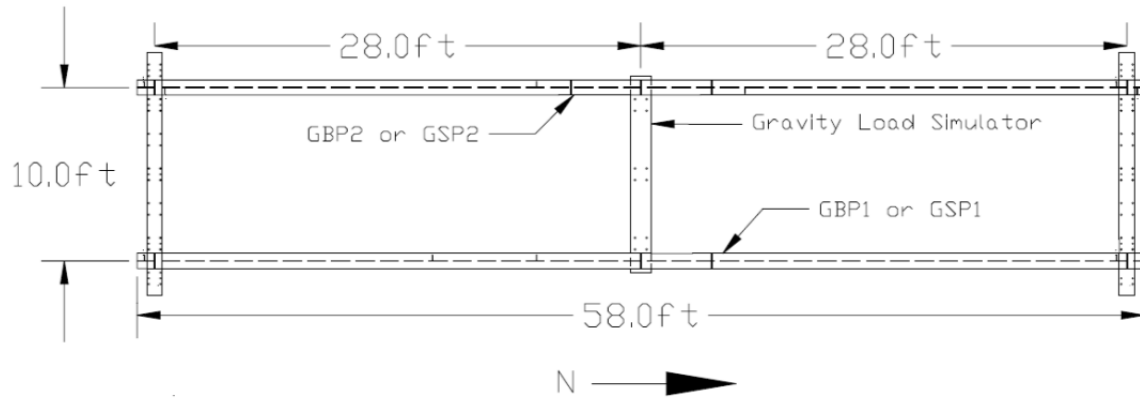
Twin girder test specimen plan view (plate stiffened specimen shown)
